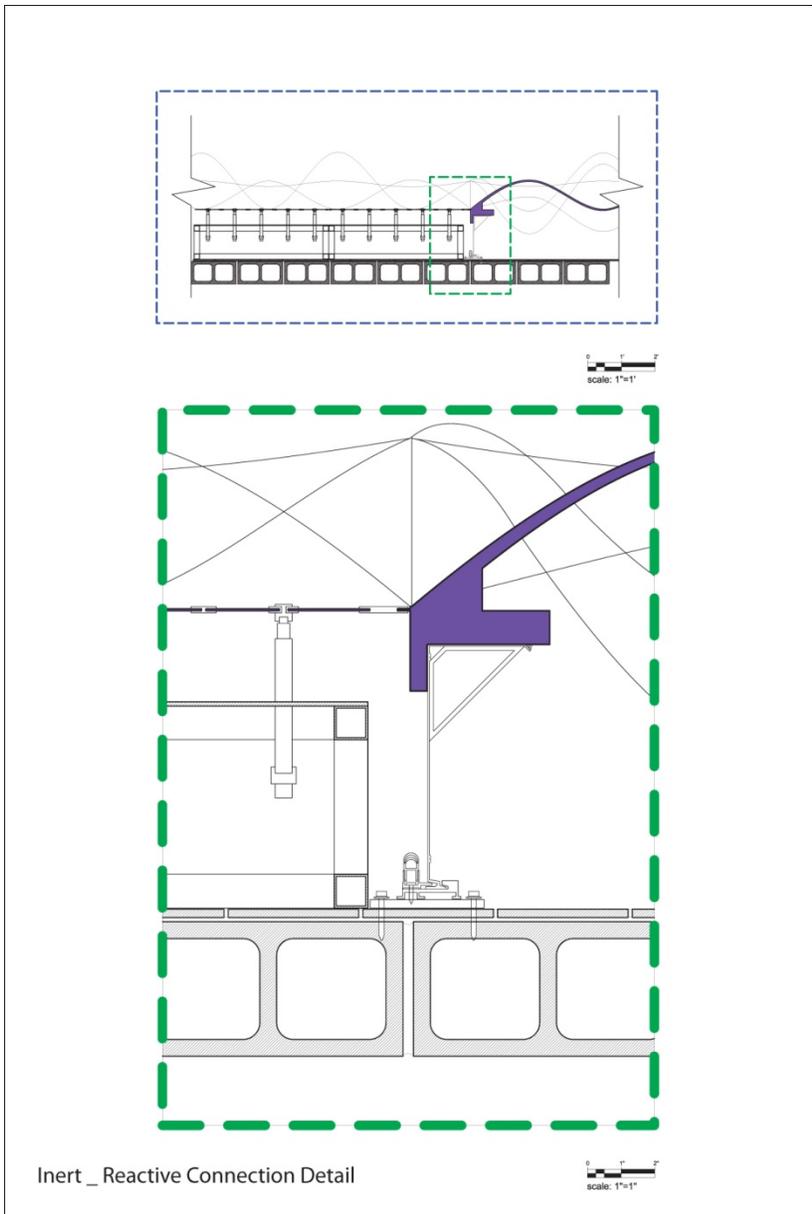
(Faulkner) Inert and Re-active Wall Connection Detail
